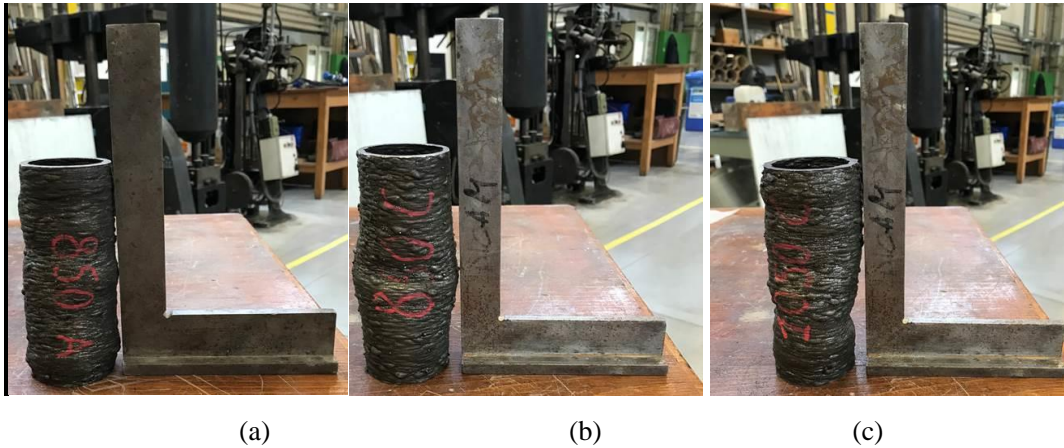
Deformed configuration of stub column coupons at the end of the test: (a) specimen CIII-1; (b) specimen CIII-3; (c) specimen CIII-6.
